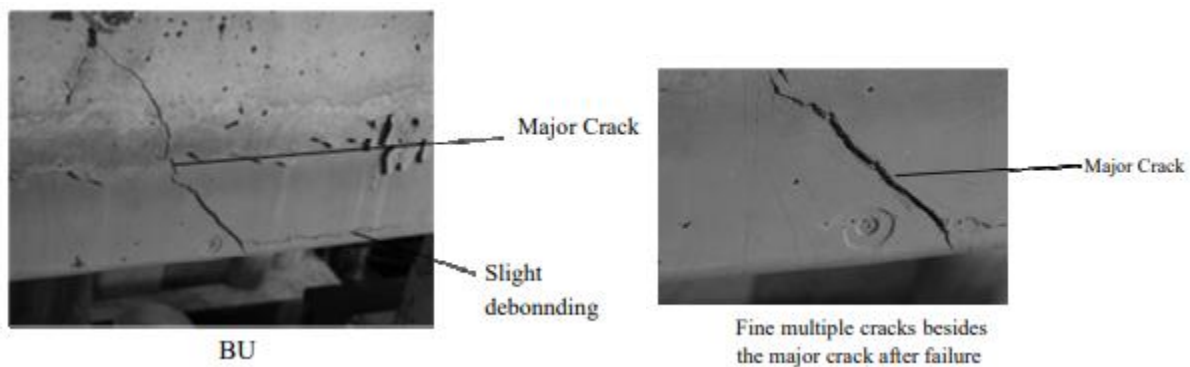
Failure of the U-shaped beam (Changli Yu et al., 2010)
